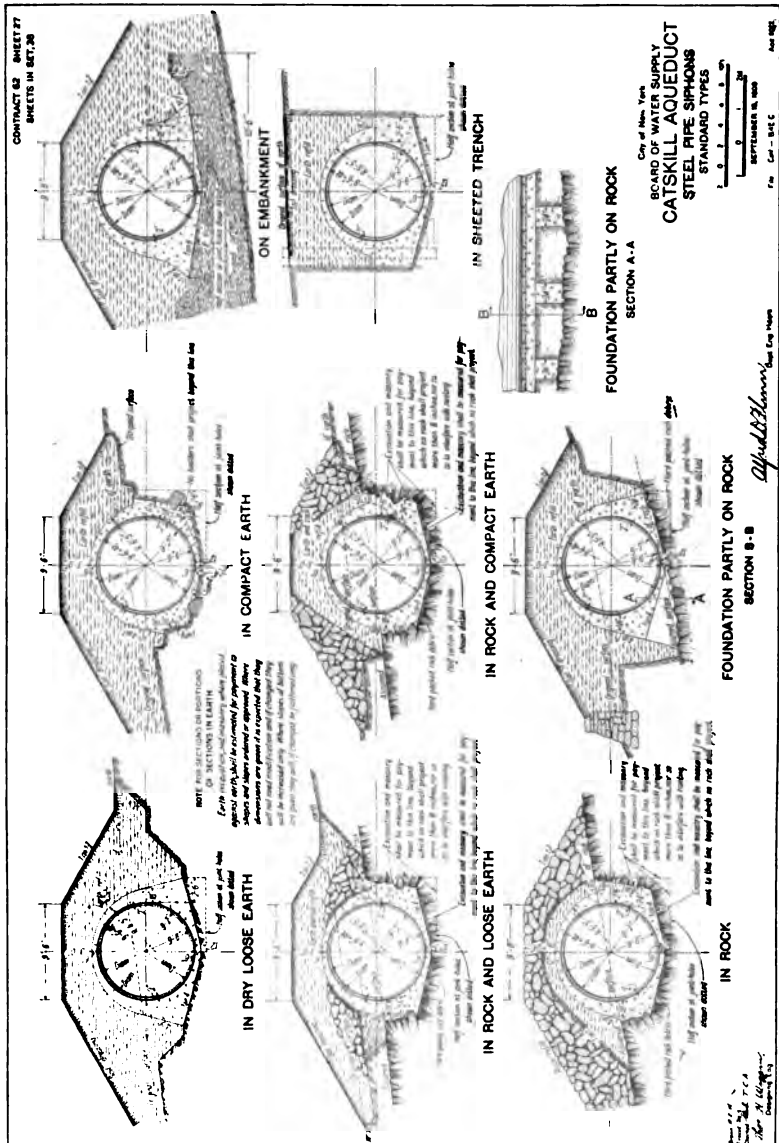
CONTRACT DRAWING.—TYPES OF STEEL PIPE SIPHON.
